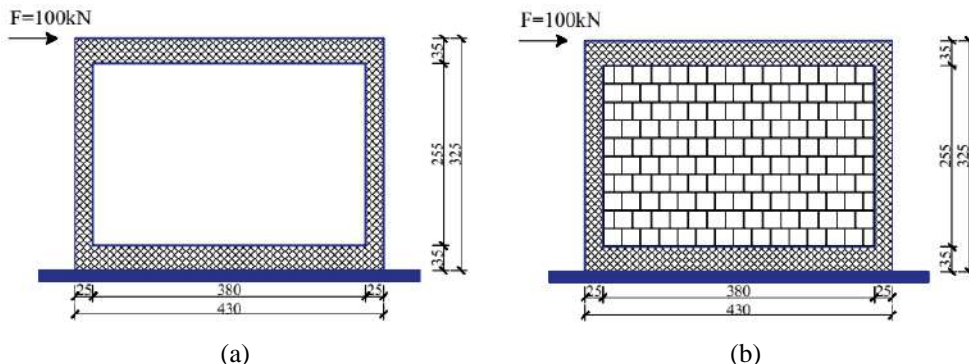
The geometry of examined structure: a) bare frame b) infilled frame
